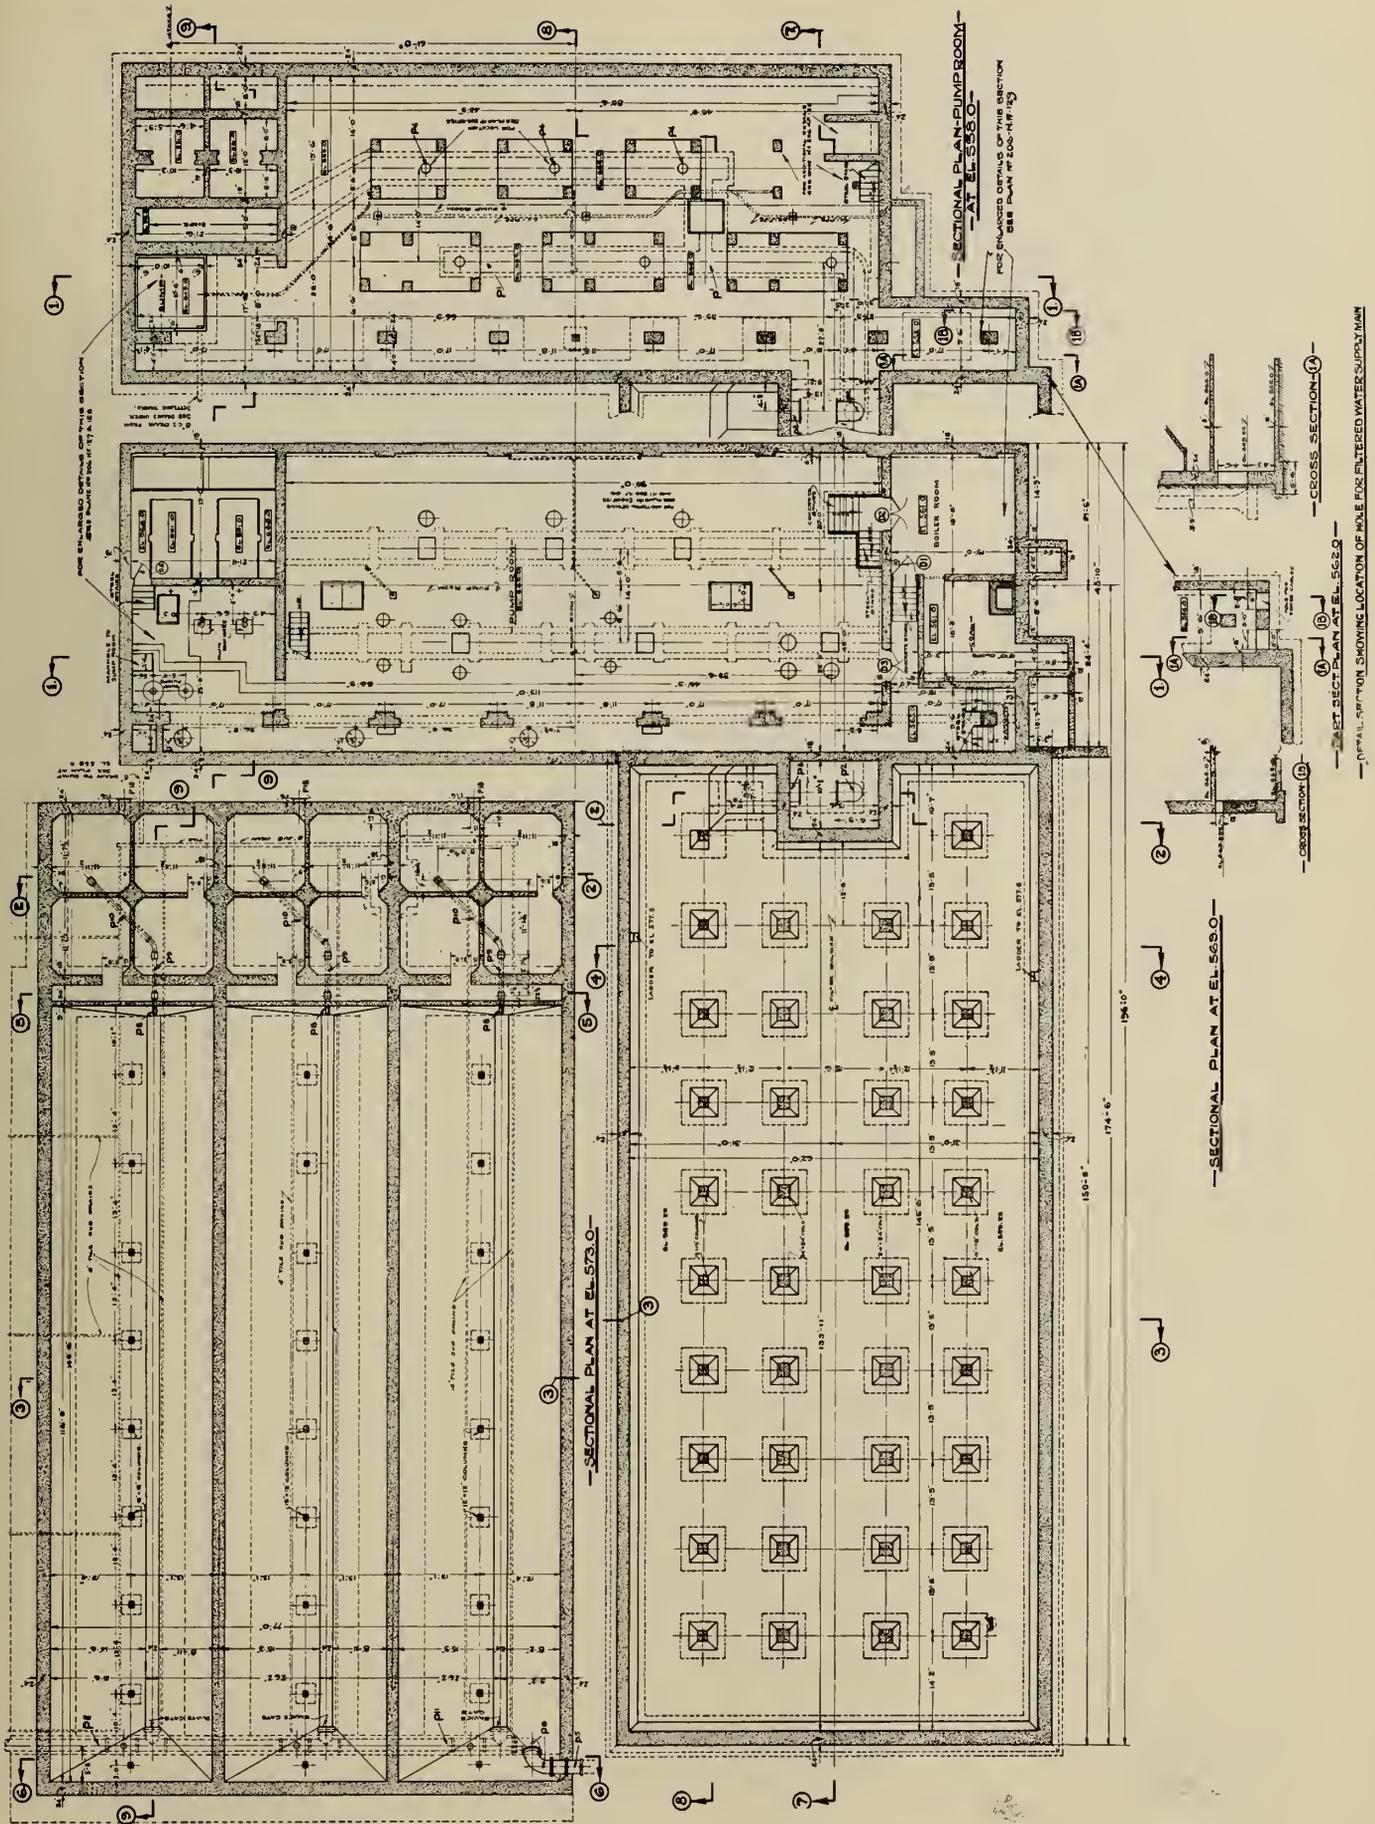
Typical Horizontal Sections of Filtration Plant.
